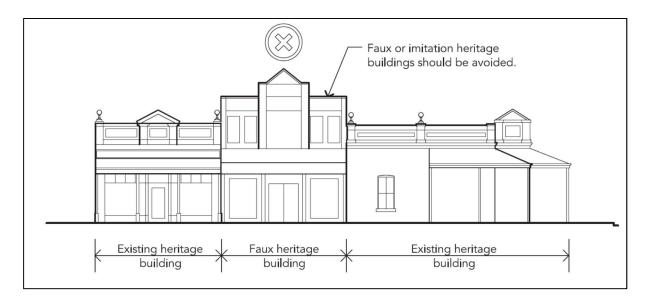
Street elevation illustrating incompatible faux heritage development.
